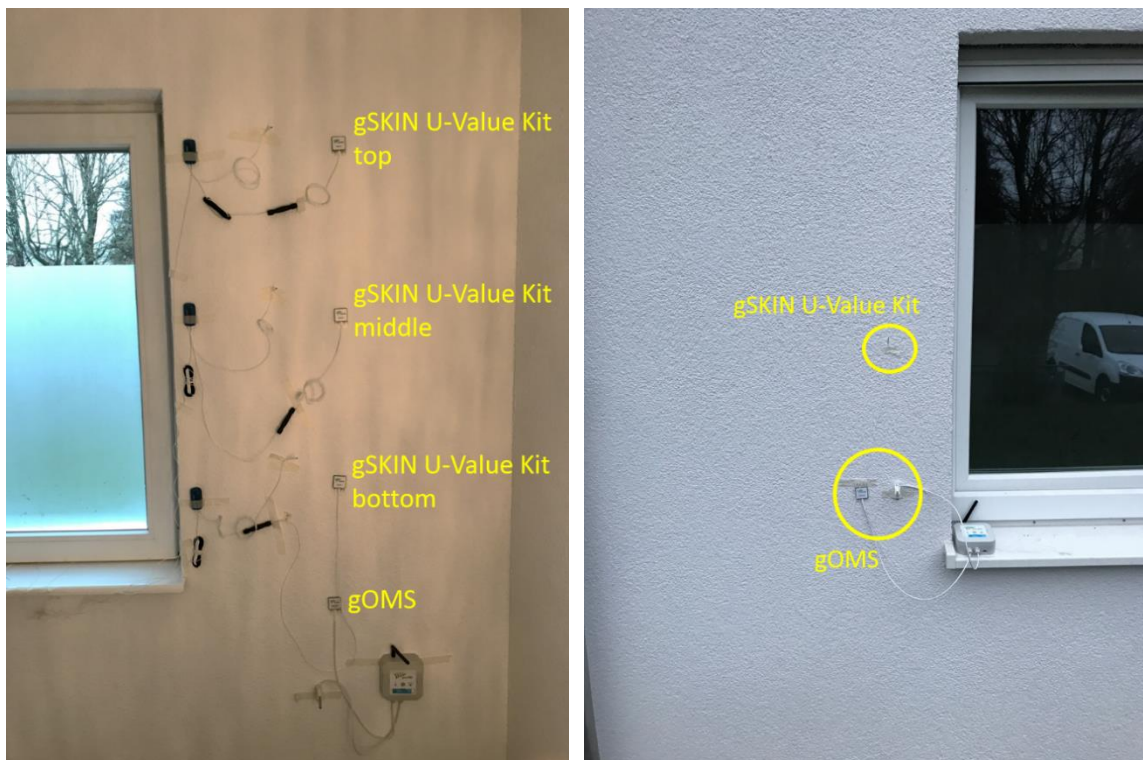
Measurement set-up inside (left) and outside (right) at the outer wall
